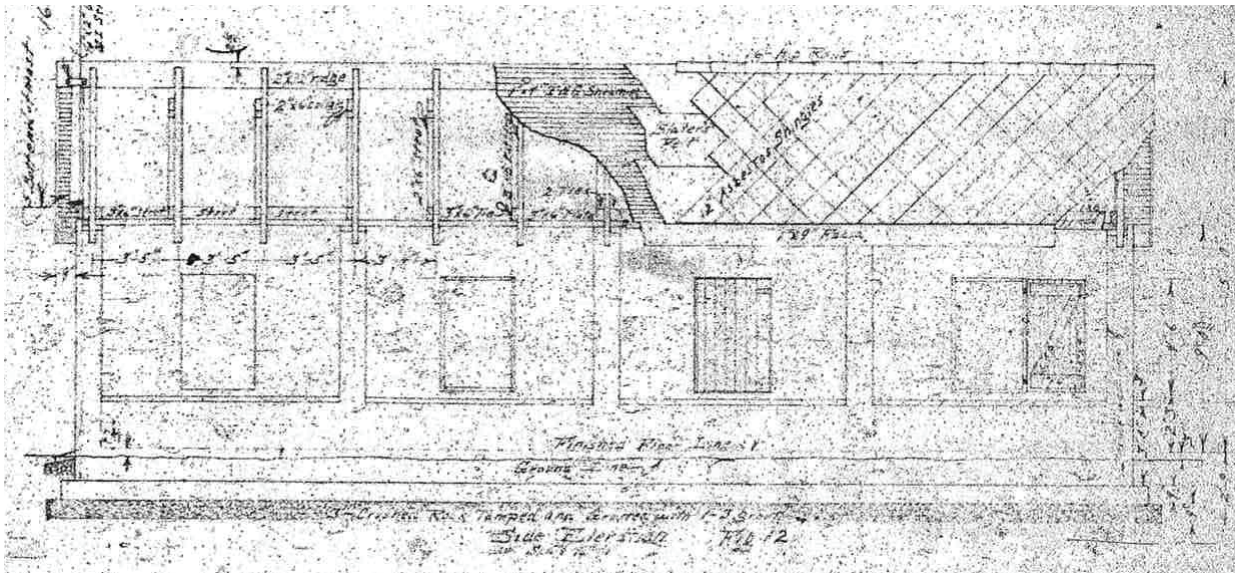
Close-up of side elevation from 1912 “Boat House & Marine Railway” drawings.
